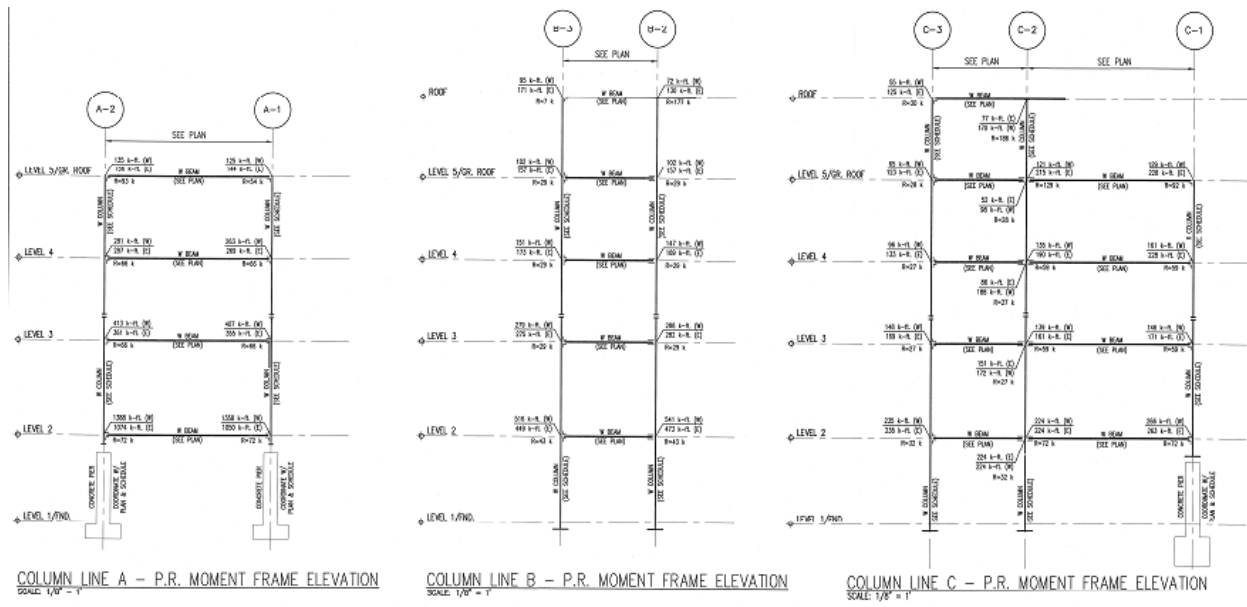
P.R. Moment Frame Elevations (A, B, and C)
